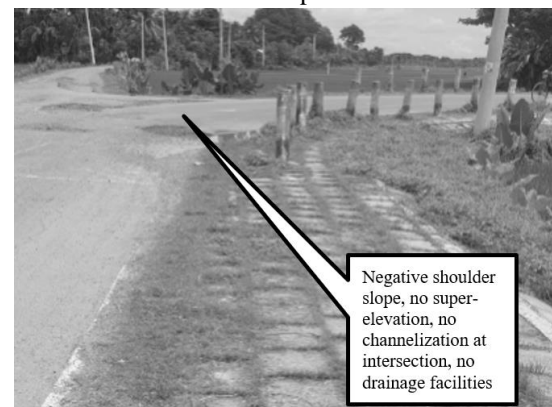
Negative shoulder slopes, no super-elevation, no channelization at intersection, no drainage facilities.
